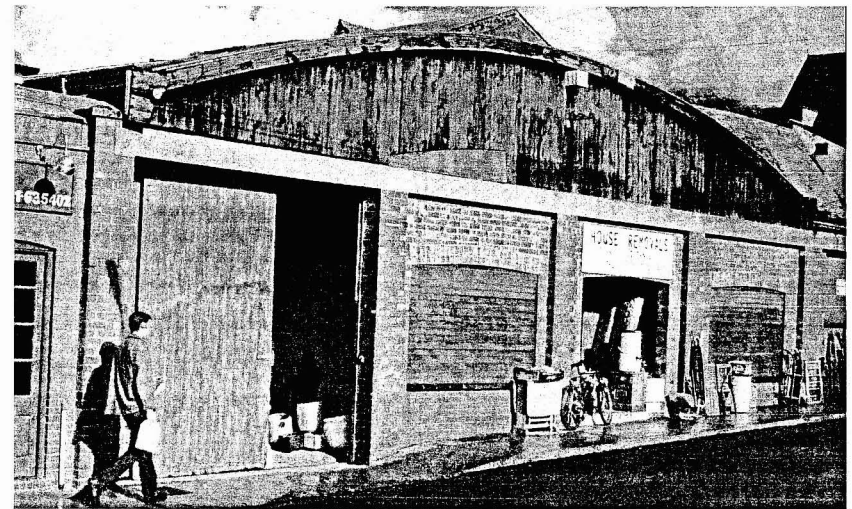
Typical building with a Belfast truss roof at Waterford, Ireland (photo: R. Gragg).
